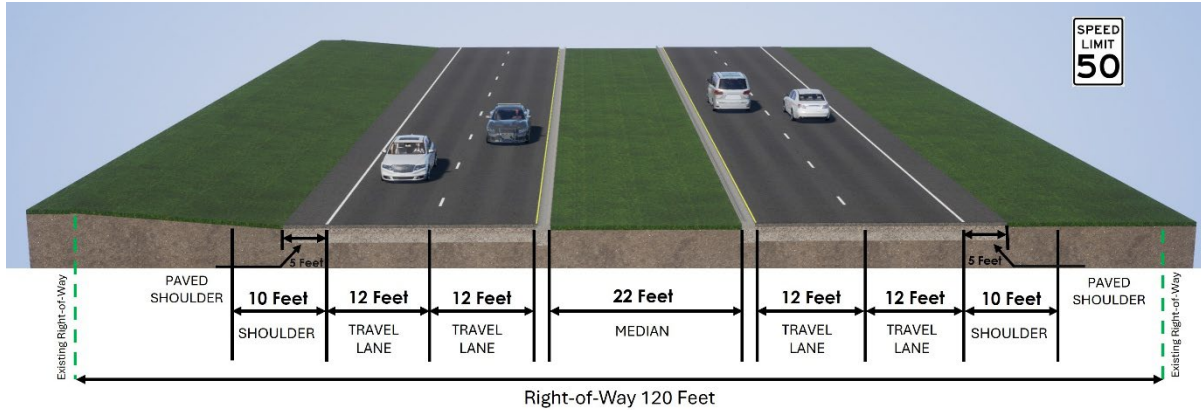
Existing Roadway North of DeSoto Bridge
